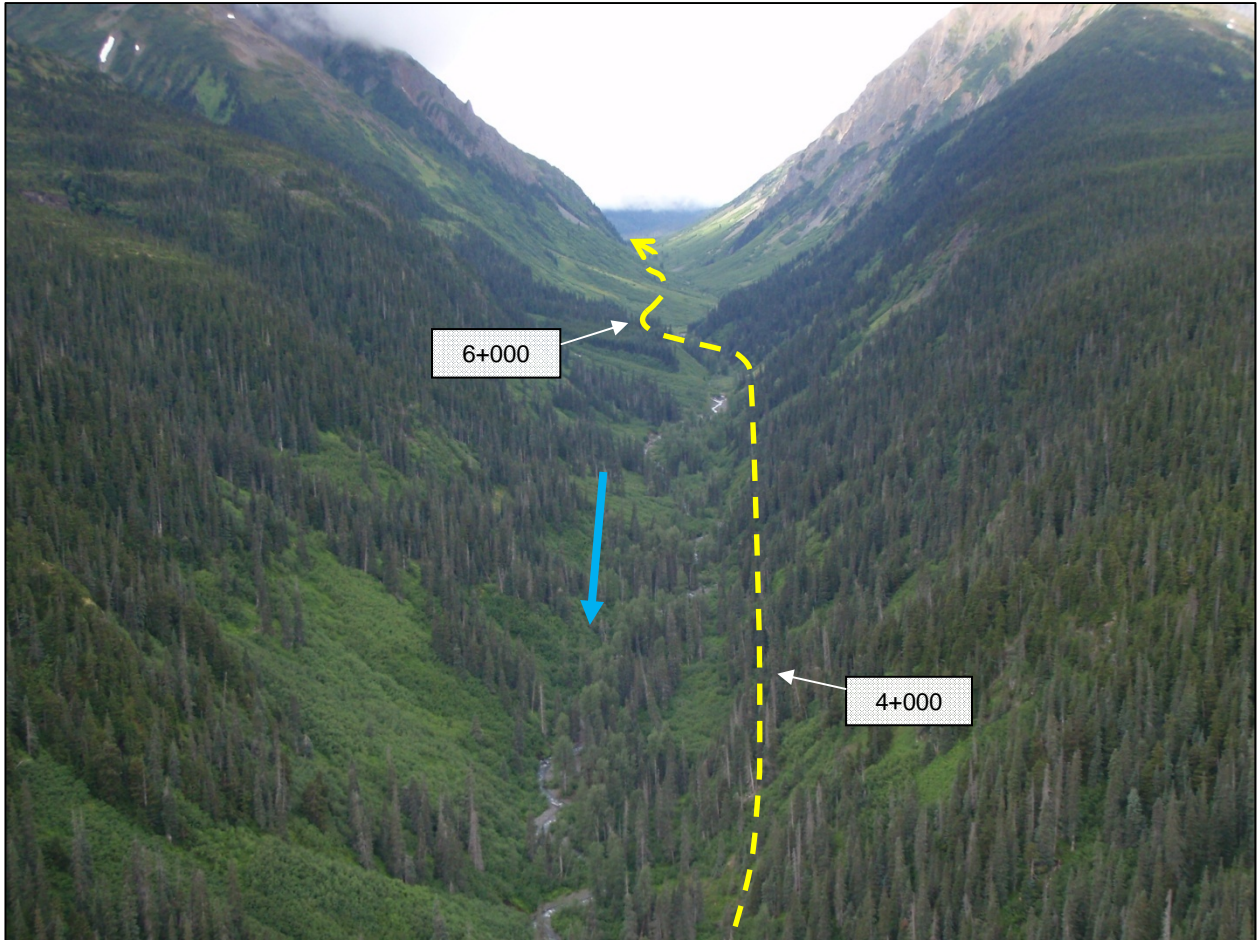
Teigen Creek Access Road – Looking downchain (northeast) towards the start of Tunnel Spur Access Road (yellow dash – starting at KP 10 Teigen Creek), Seabee Camp (KP 8) and Highway 37 from the proposed Tailings Management Facility at KP 14.
